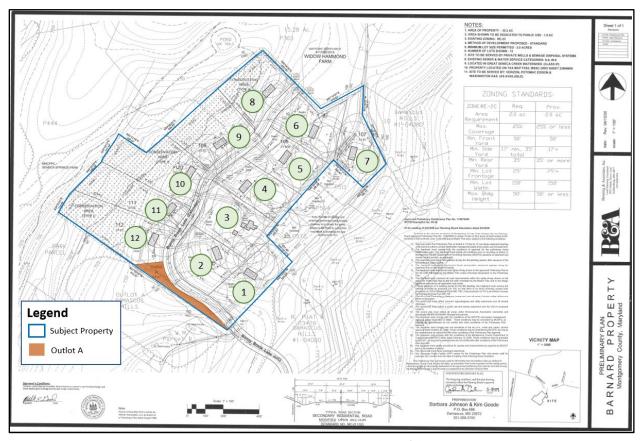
Approved Preliminary Plan with an outline of the Subject Property, a highlighted outlot area, and the 12 lots numbered.
